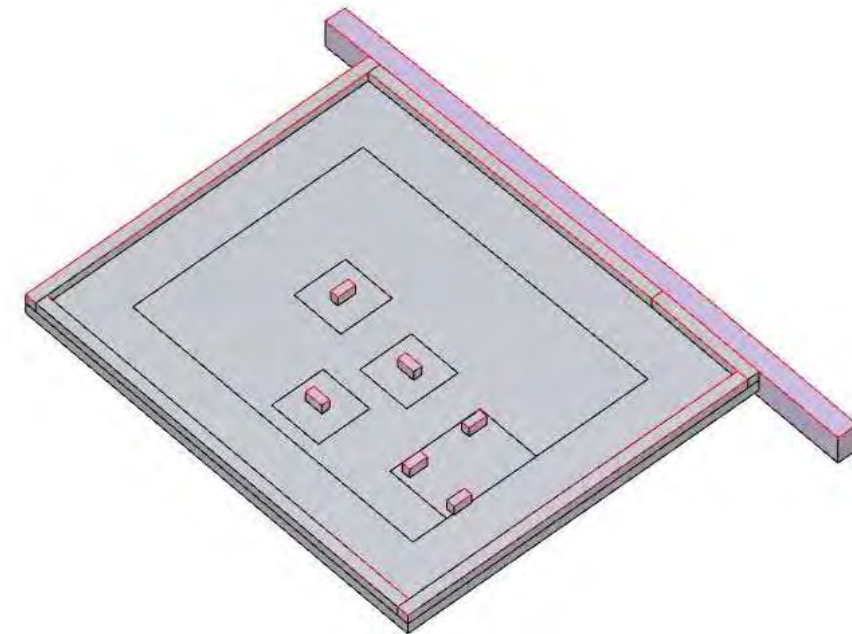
Basement level retaining wall boot construction and wall stem kicker shown adjacent to underpinned boundary wall
